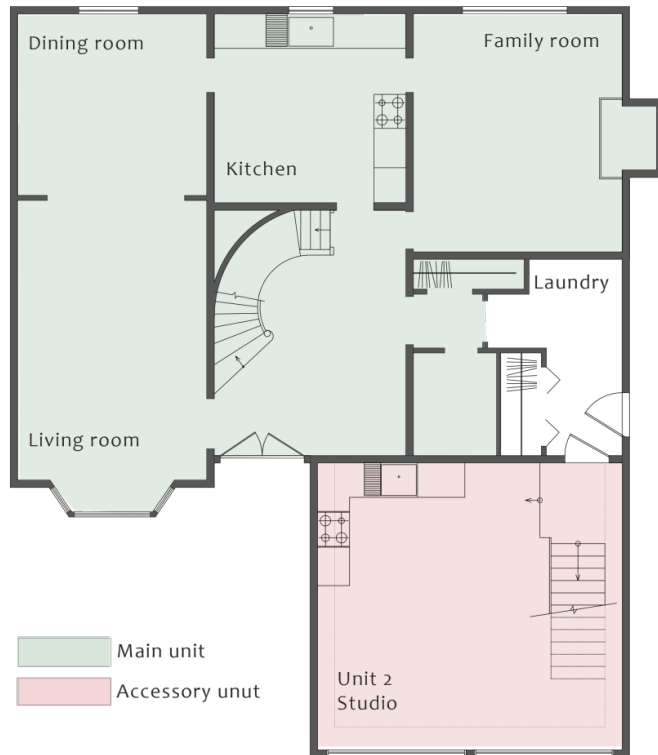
Ground floor plan. Alterations made: the two-car garage was converted to a studio room with a staircase going to the upstairs bedroom
